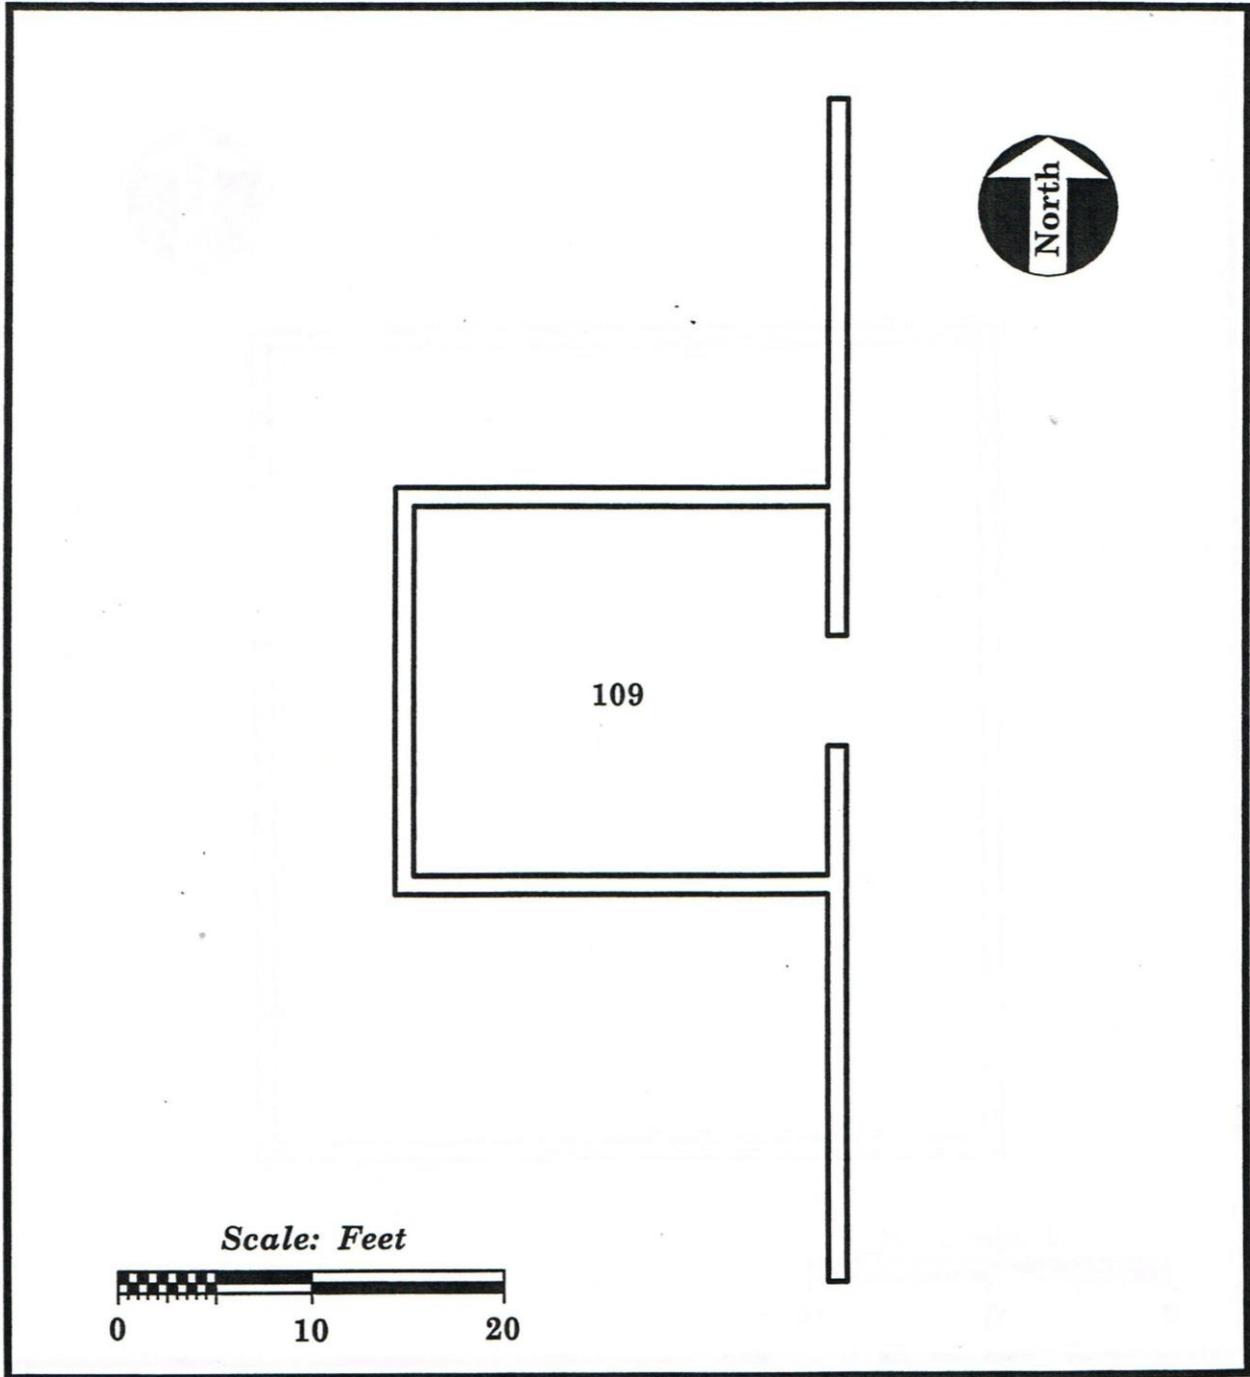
Building 817F, Facility Plot Plan, 1997. LLNL Archives, (Figure A-15)
